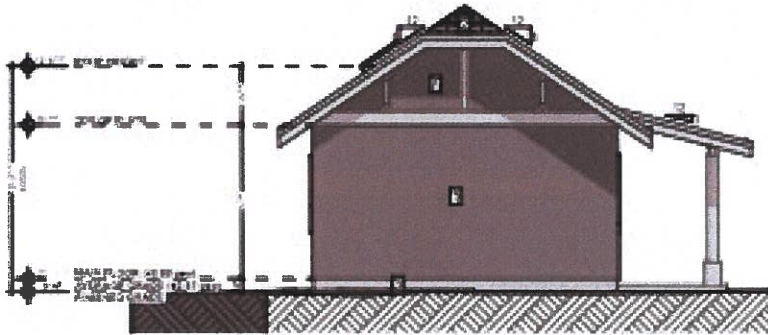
Proposed Left (east) Elevation (from plans by Adapt Design)
